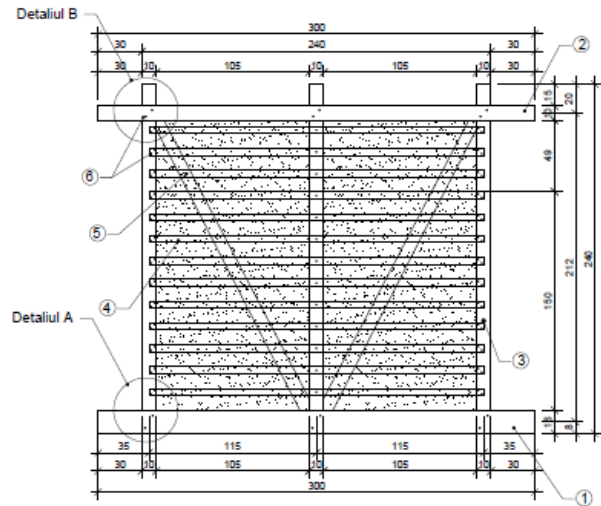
Specimen S2 (from type 2) - timber and earth with straw infill structure: 1 – inferior stringer; 2- superior stringer; 3 – column; 4 – timber strips; 5 –earth and straw infill; 6 - iron nails connections of strips and cross – halving connections of timber elements (columns and stringers)
